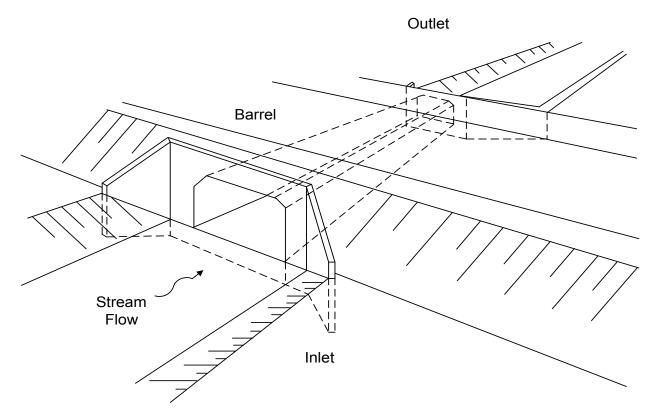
(a) Basic Culvert, Tunnel and Soil-Steel Structure Components
